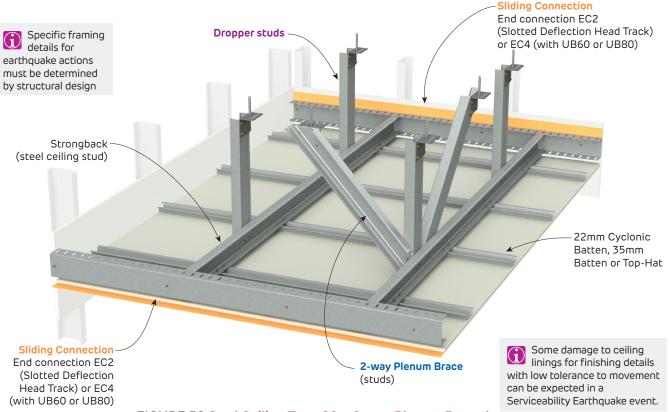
Stud Ceiling Type C2 - 2-way Plenum BracedPerspective
